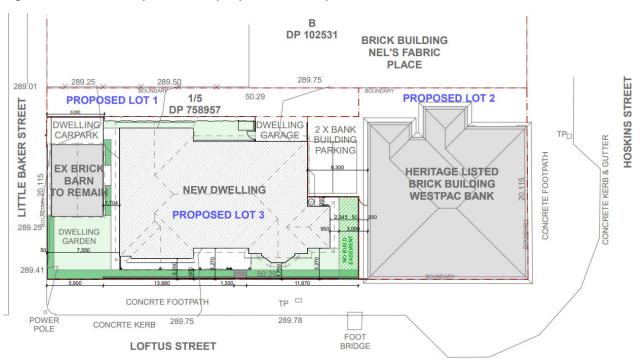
Site plan showing existing bank building, proposed new dwelling and existing barn building Figure 3 shows the proposed southern elevation of the proposed development.
